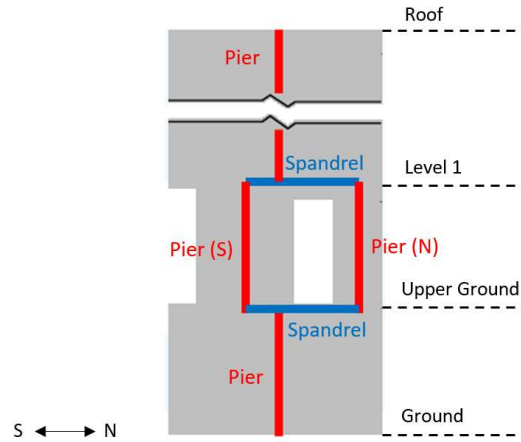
Modelling Wall N3 with piers and rigid spandrels
